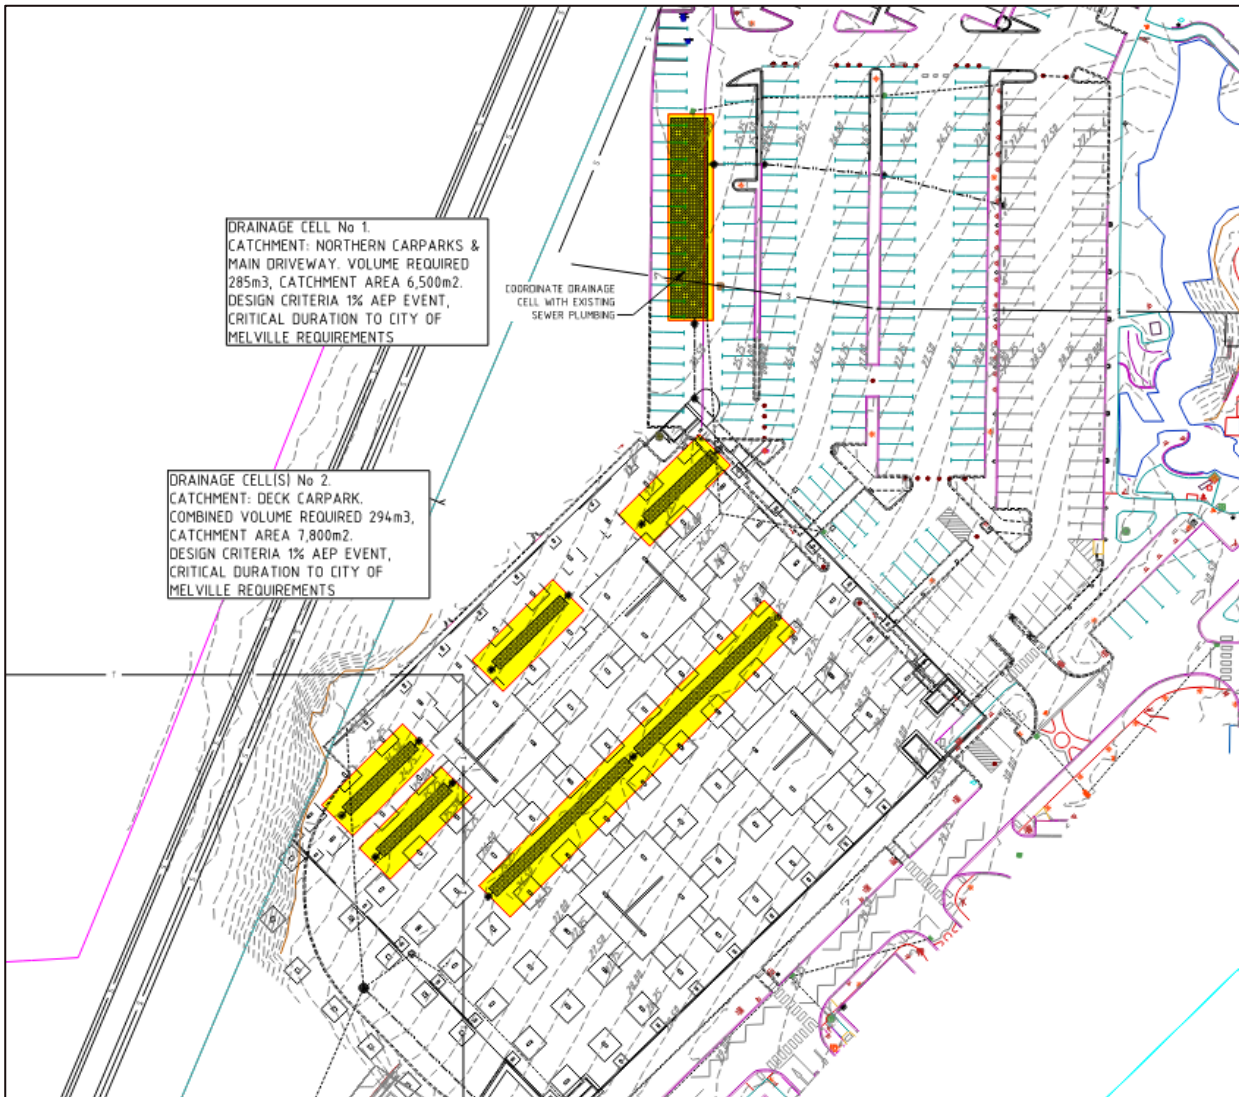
Stormwater drainage cells that form part of the early/enabling works
